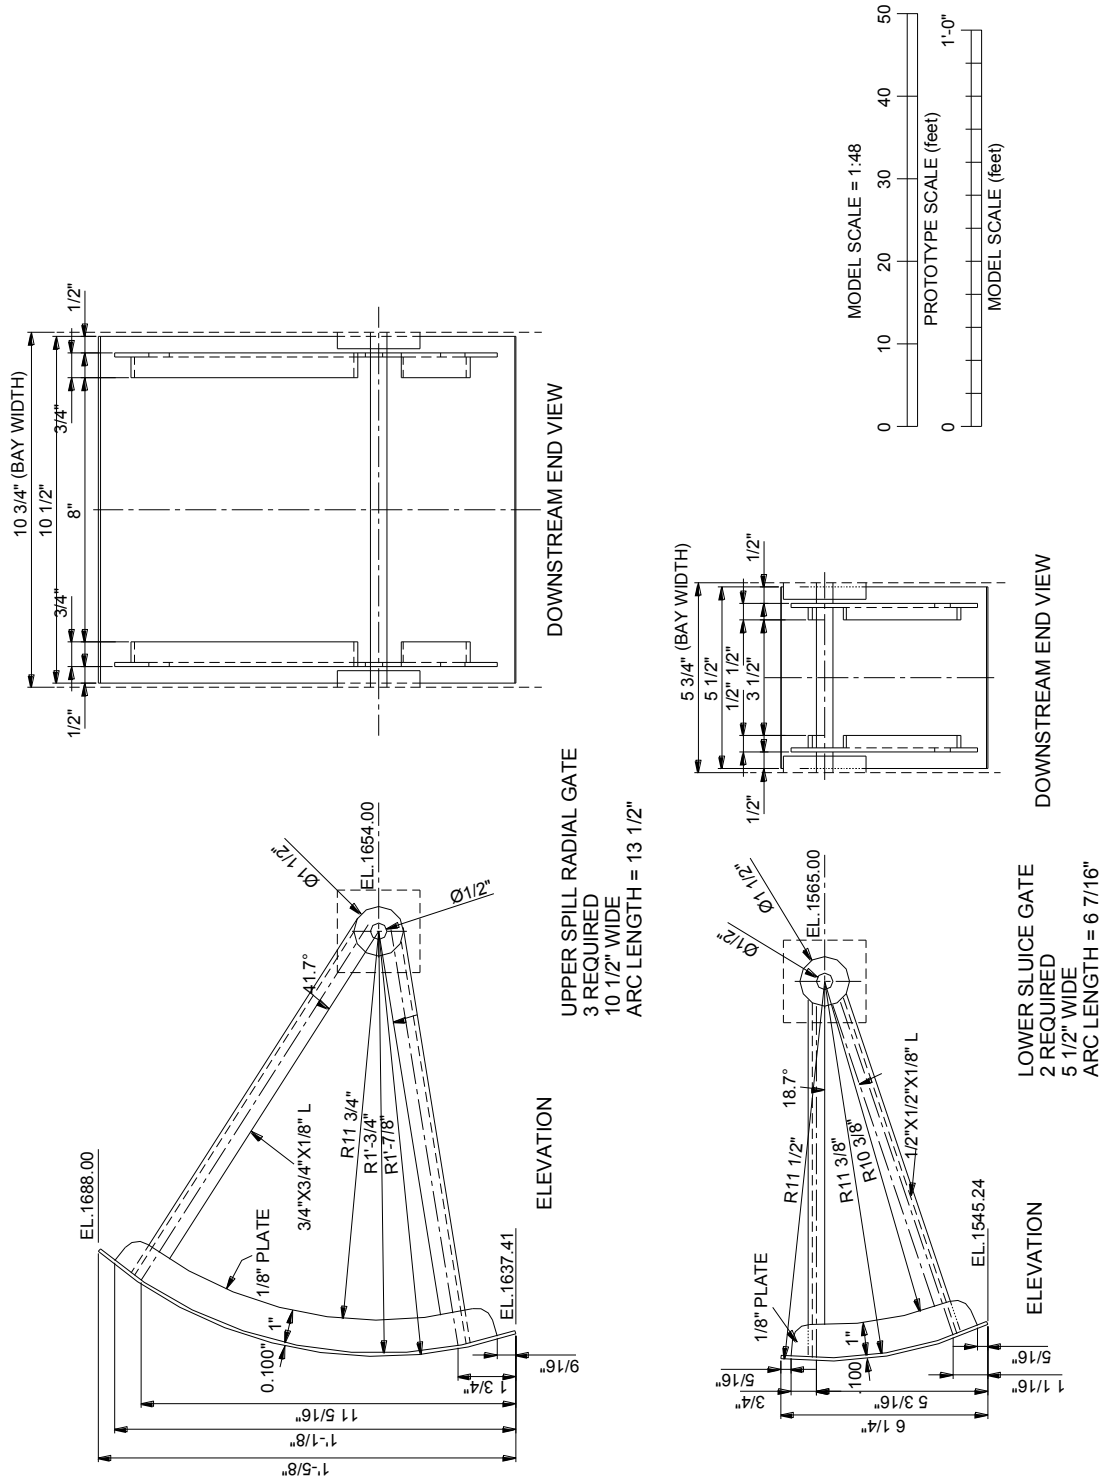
Details of Spillway and Sluiceway Gates for 1:48 Sectional Model
